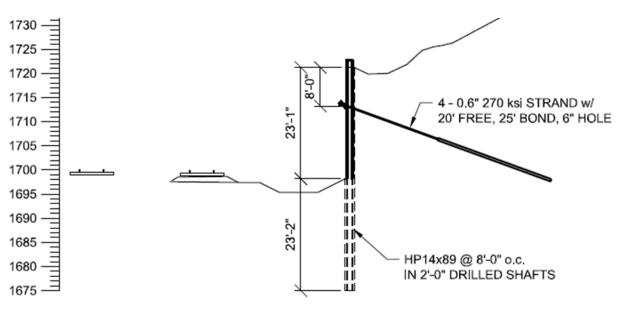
42.5 Foot Offset, Wall Location 1 Soldier Pile Wall
